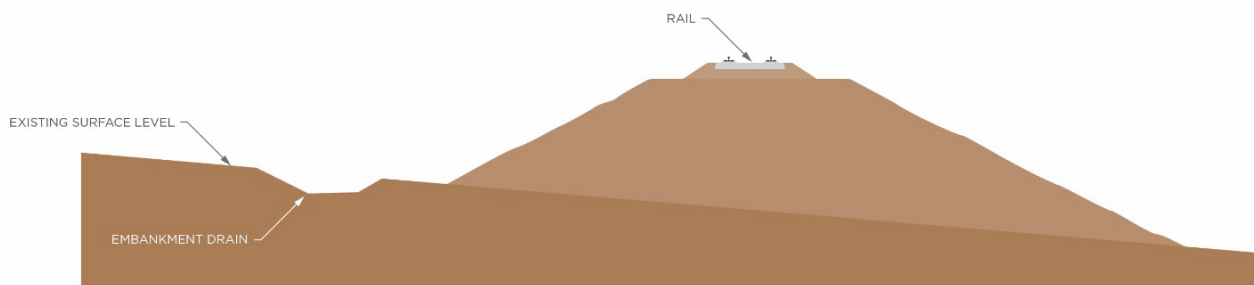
TYPICAL LONGITUDINAL DRAINAGE FOR RAIL FORMATION ON TOP OF EMBANKMENT
